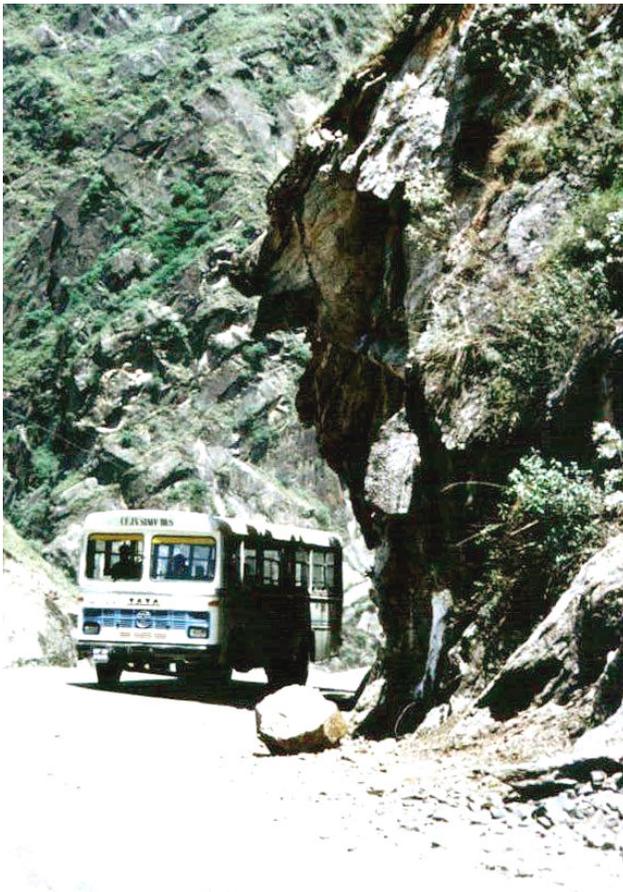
A rock slope on a mountain highway. Rockfalls are a major hazard on such highways
